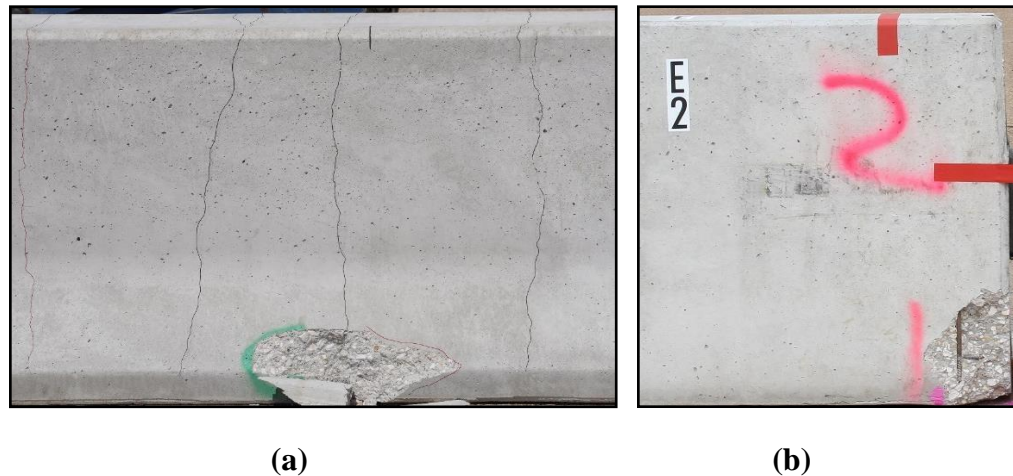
Spalling Observed in Crash Barriers in Bogie Tests: (a) Spall on the Middle Base of the Barrier; (b) Spall on the Toe of the Barrier.
